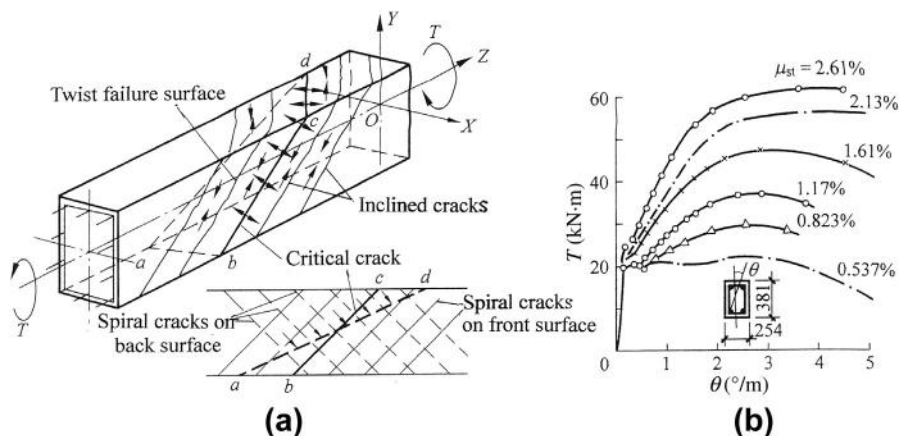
Beam with web reinforcement under torsion: (a) cracks and failure surface, (b) torsion-twisted angle relation
